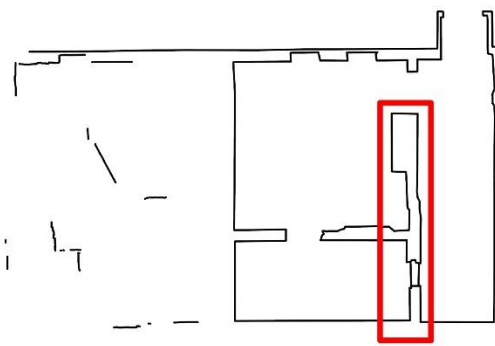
The location of the cellar wall dividing Campaign Two and Campaign Four. This wall is where the break in the wall shown in Figures 72 and 73 is located. The brick bond on this wall changes where the break occurs.
